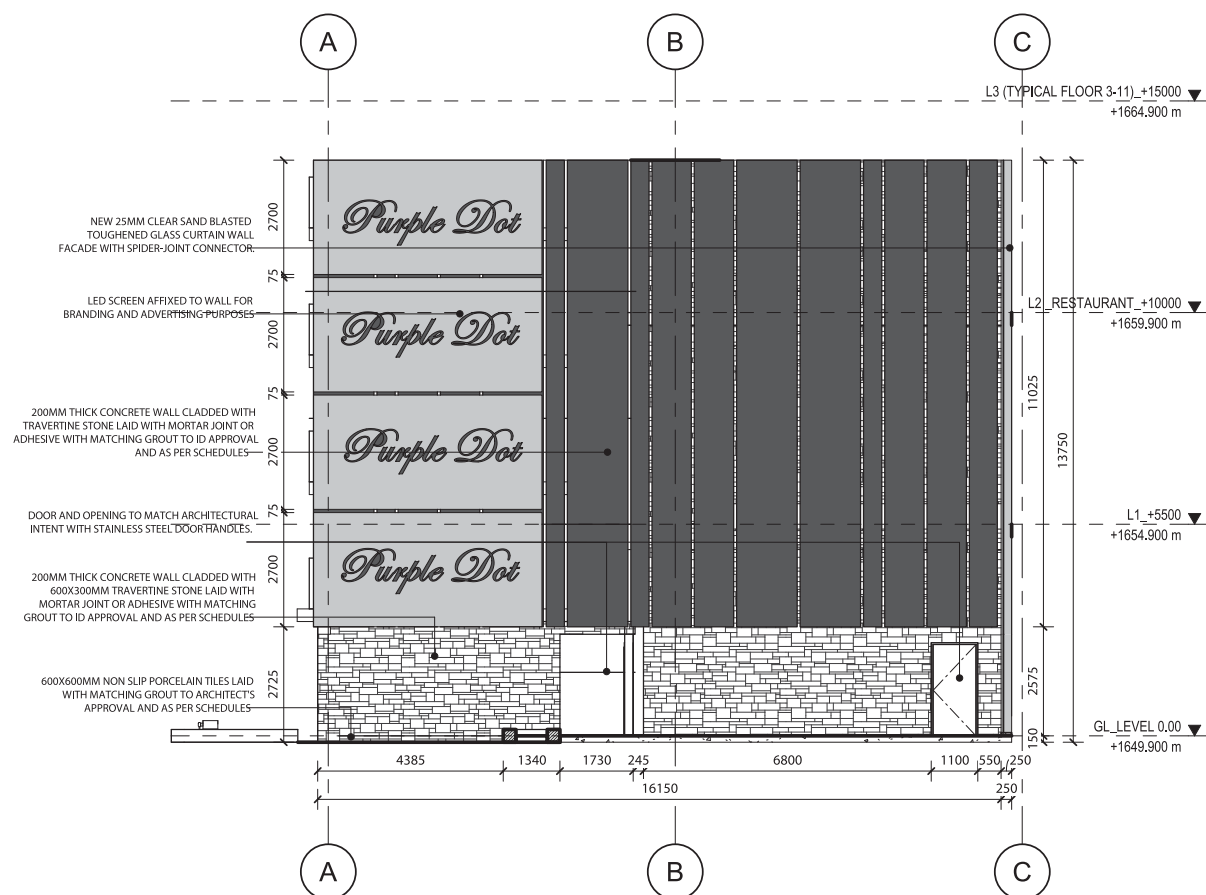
DETAILED SECTION DRAWING OF PURPLE TOWER'S EXTERNAL BUILD (NORTH - MAIN ENTRANCE)
